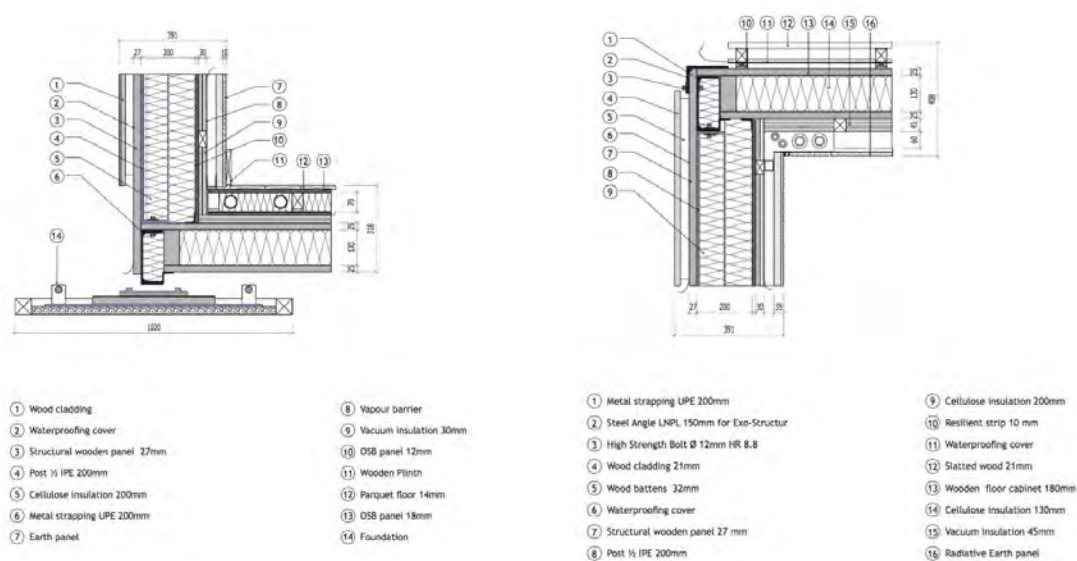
Canopea house construction details¹⁰⁹ (down corner section – left and upper corner section – right).
